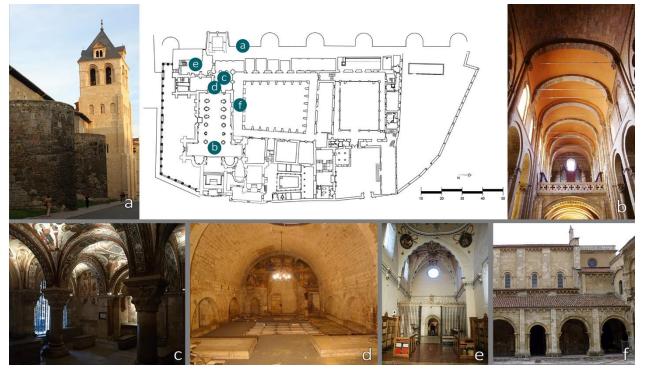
Plan and views of the Real Colegiata of San Isidoro: a) Roman Wall and tower; b) Basilica; c) Pantheon (ground floor); d) Camara de Doña Sancha (upper floor); e) Library (upper floor); f) Cloister.
